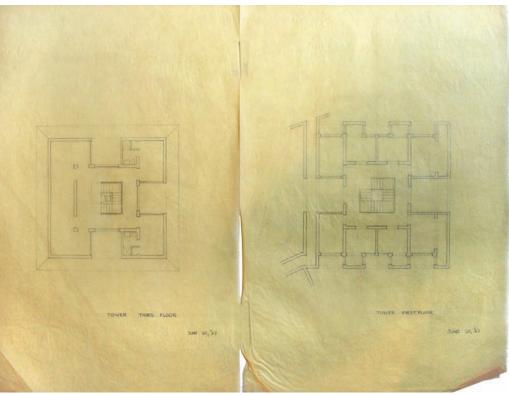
Tower: Floors 2 + 3 June 28 1967
